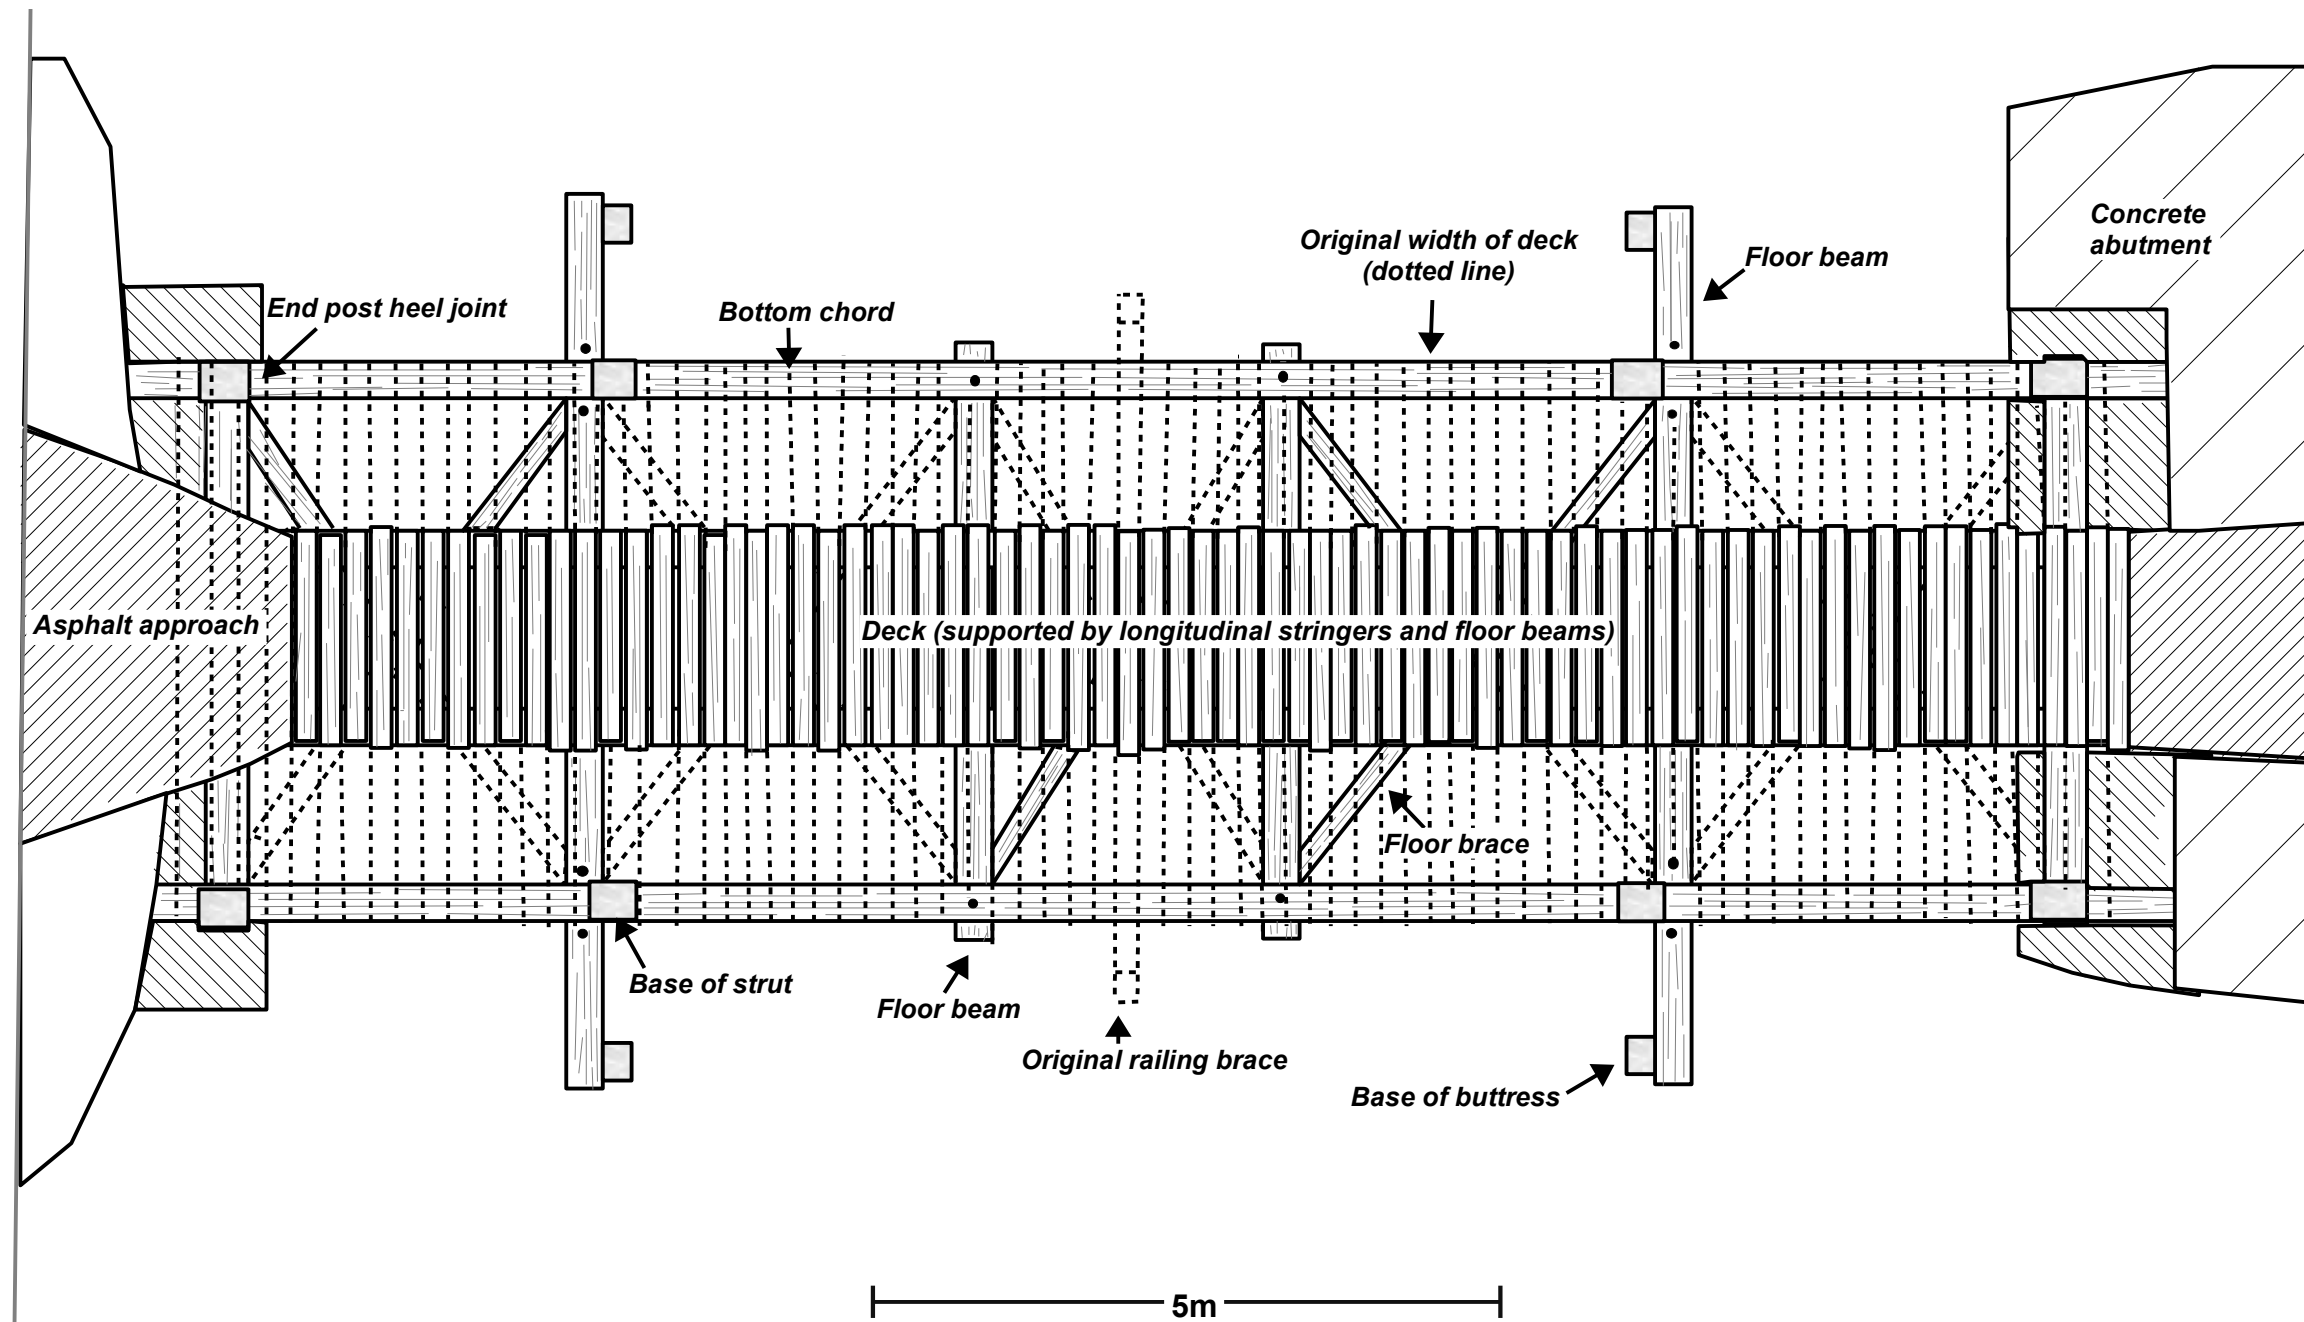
Beechwood Lane Bridge – Plan view of deck and underlying structure (missing timbers represented by dotted lines).
